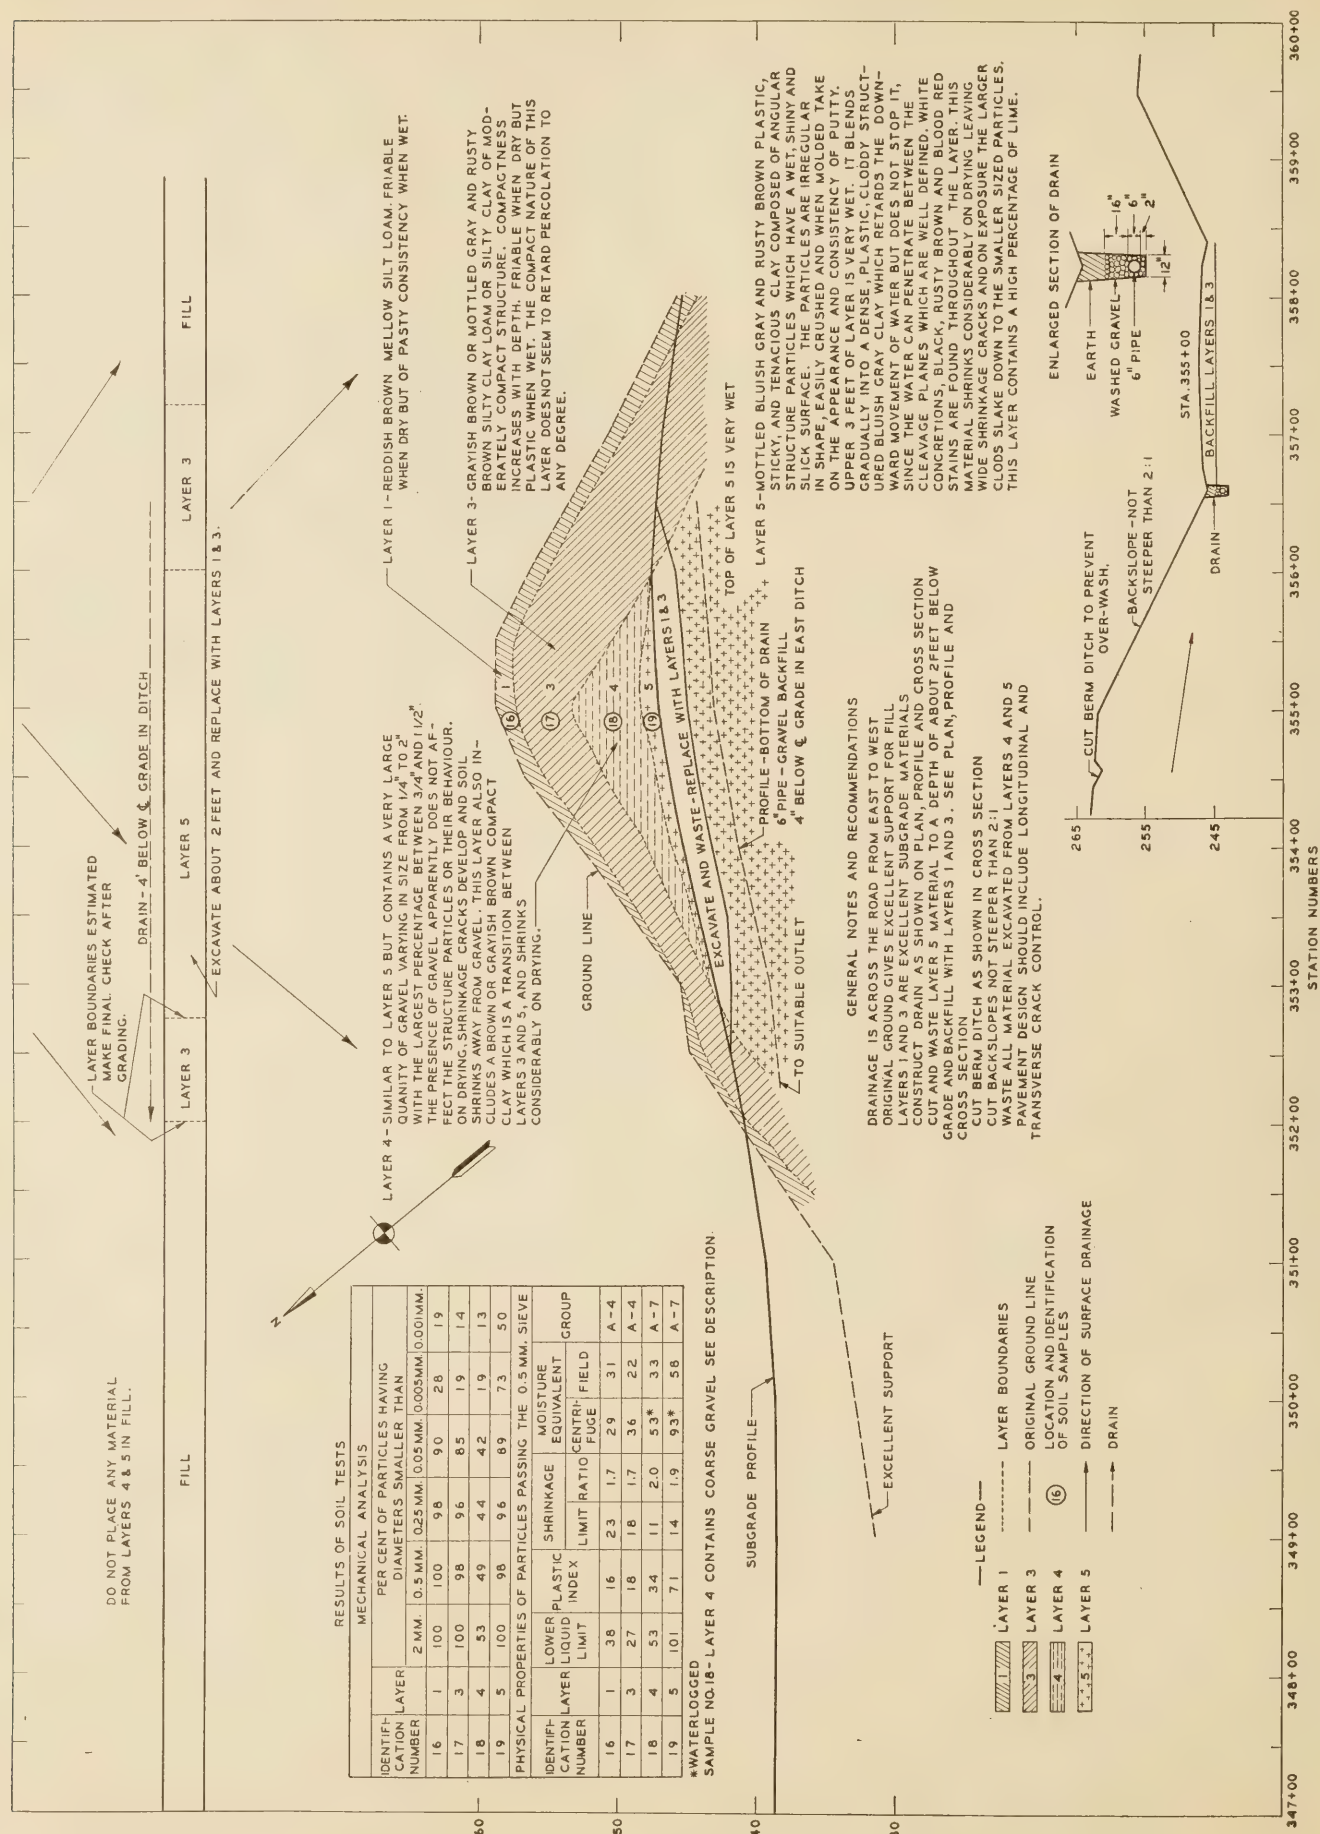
SUBGRADE SURVEY SHEET FOR THE DESIGN OF NEW ROAD
